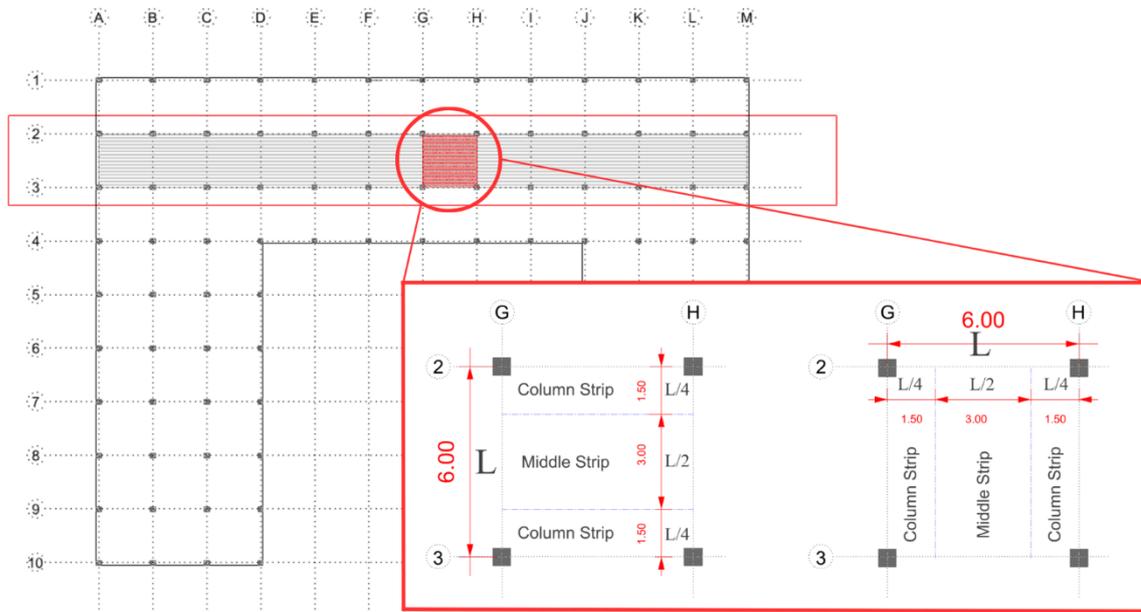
Slab span details and Eurocode 2 slab design considerations for a sample 6-meter bay width
